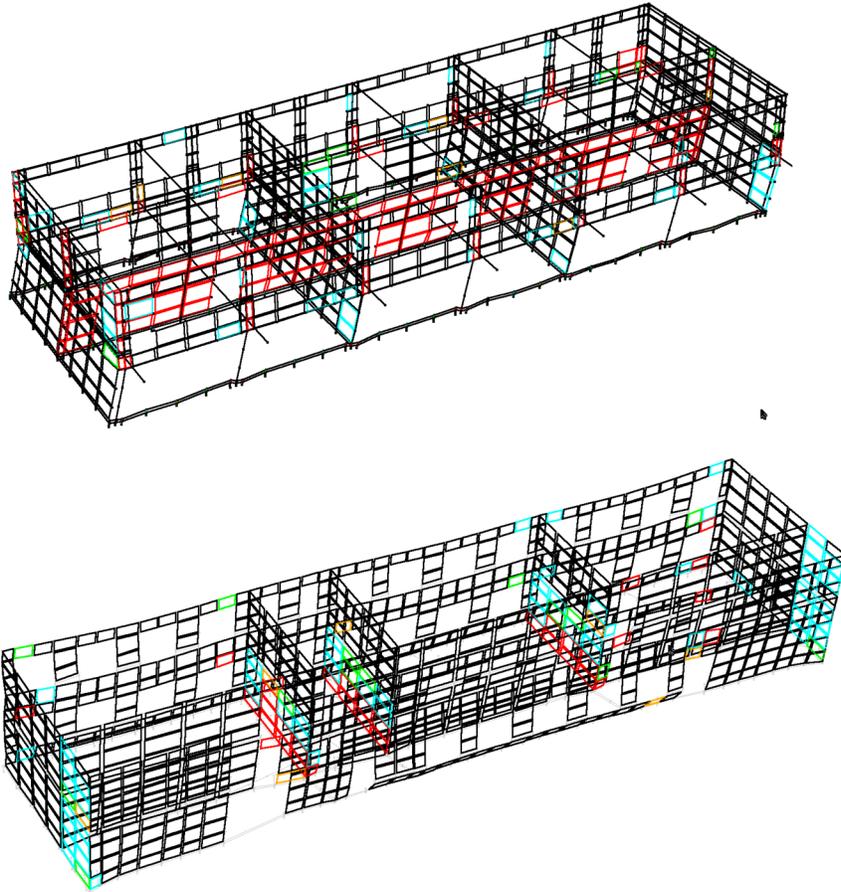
Three-dimensional nonlinear model of two-story complex masonry (CX) building below and two-story concrete frame with infill (RC2) above.
